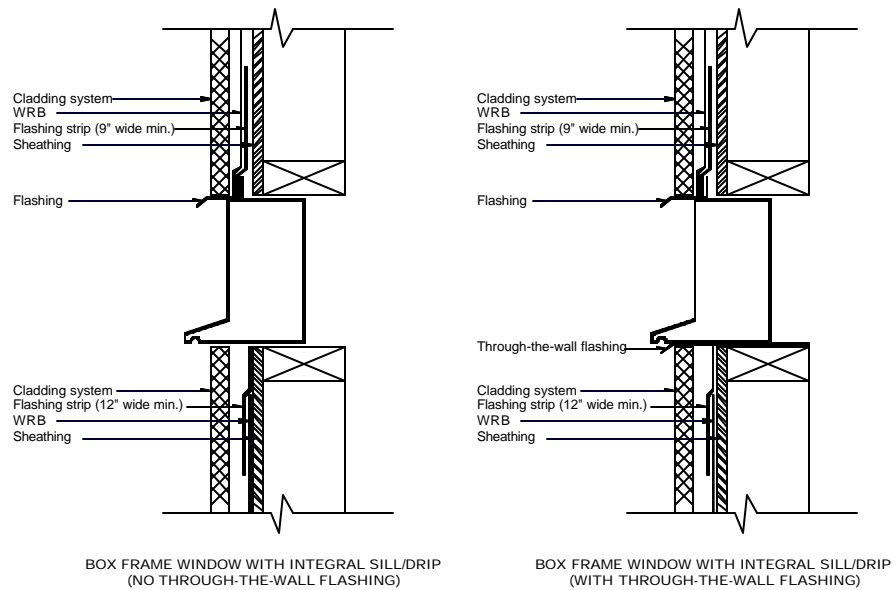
Box frame window with integral sill and recommended overlap between flashing and WRB
